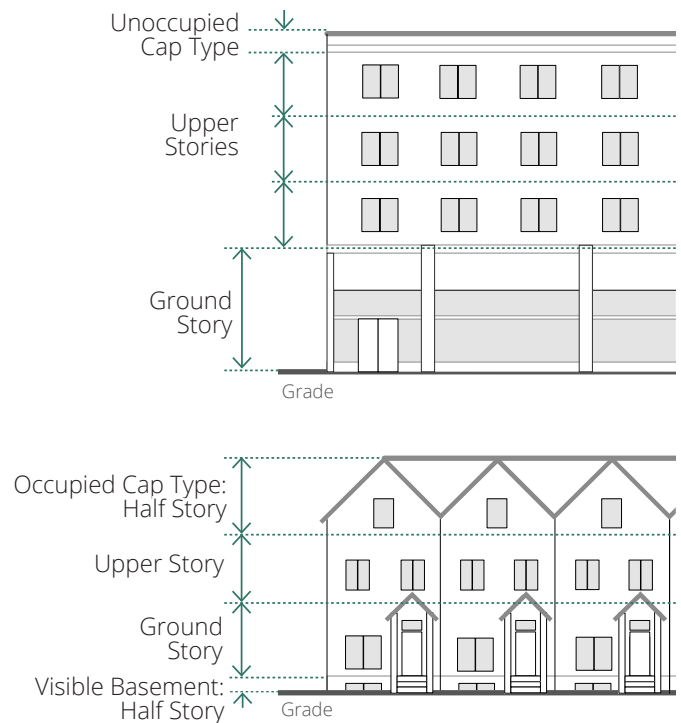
B-3. Measuring Stories with Floor-to-Floor Height
